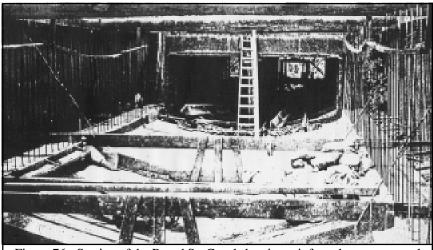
Section of the Broad St. Canal showing reinforced concrete canal construction, 1914 (from Sewerage & Water Board 1914).
